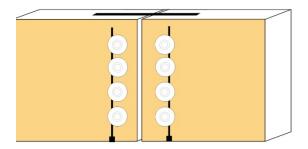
Screw reinforcement to a bolted or dowelled connection. (Image credit: TDA)
